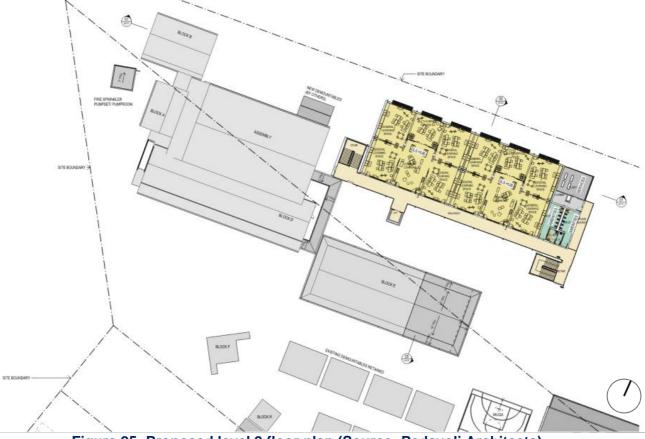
Proposed level 2 floor plan (Source: Pedavoli Architects)
